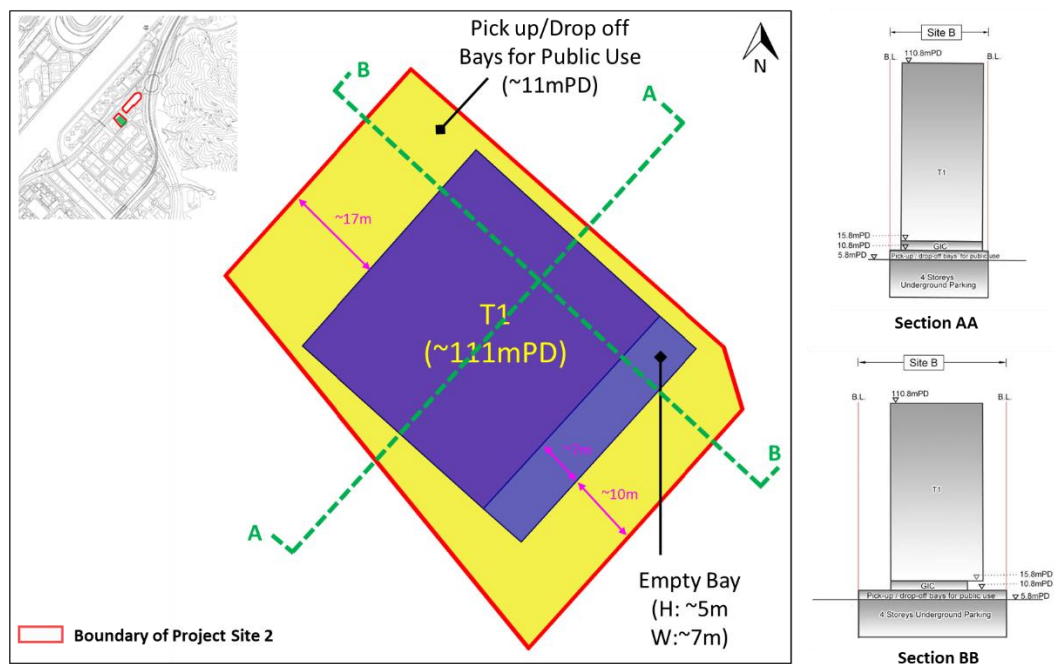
(b) Indicative Development Layout and Cut Section within Project Site 2
